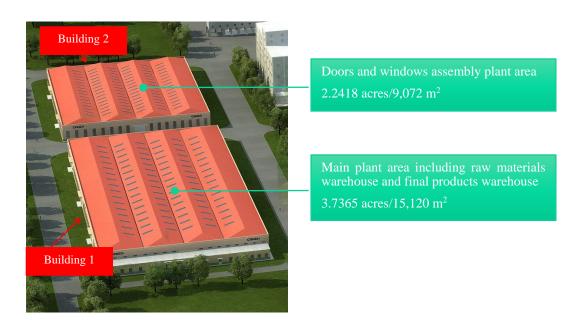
Aerial view of proposed project Plant Design (Building 1 & 2)
